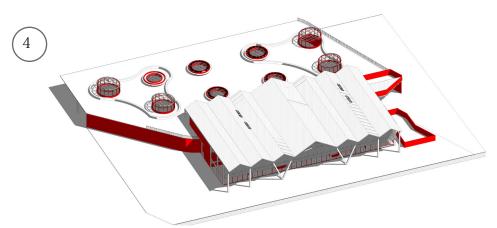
Complete structure (Masu 2023) And lastly the steel roof structure.
